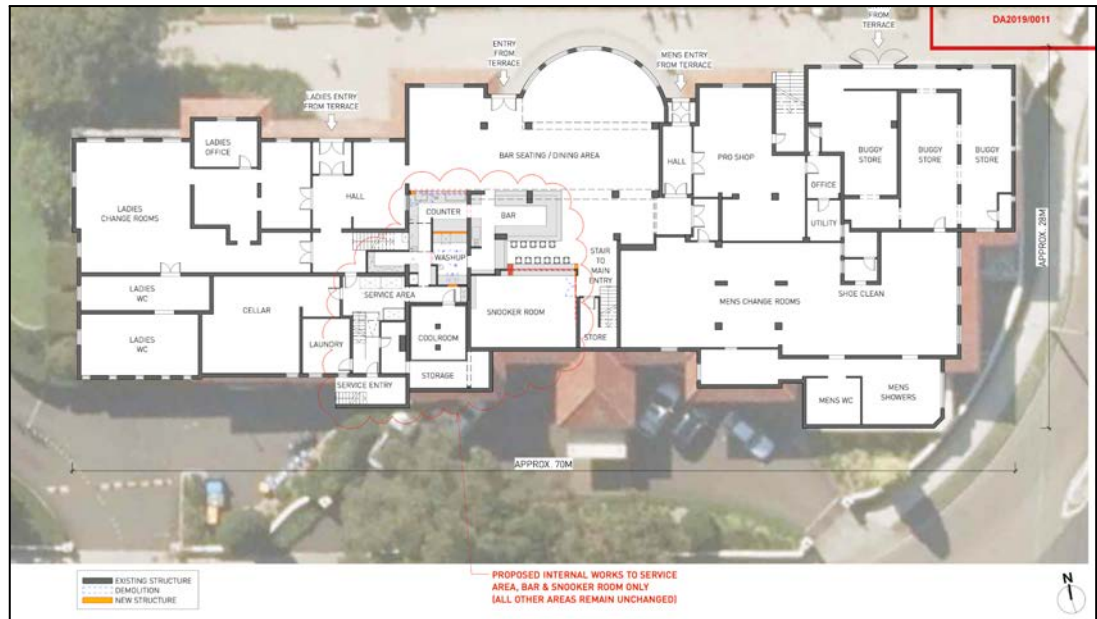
Approved plans for DA/2019/0011, noting the areas of alterations previously approved.
